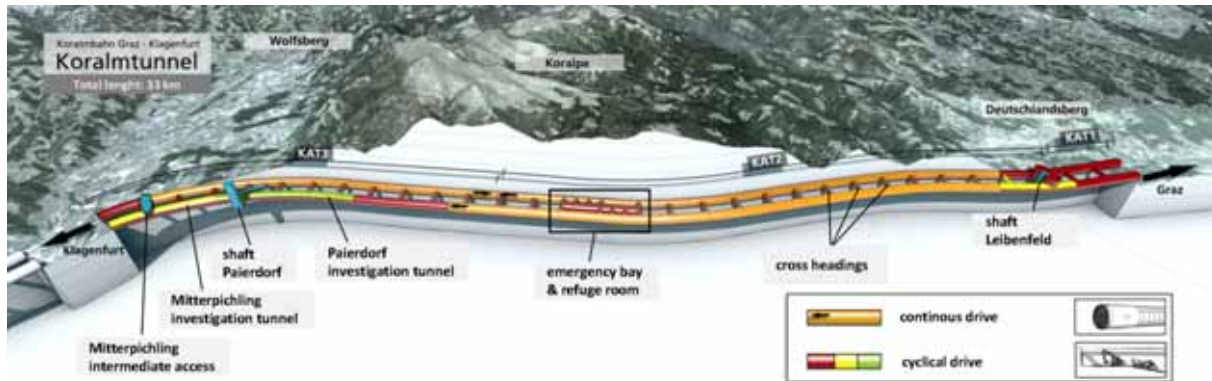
Construction lots division and tunnelling types (Source: ÖBB)
